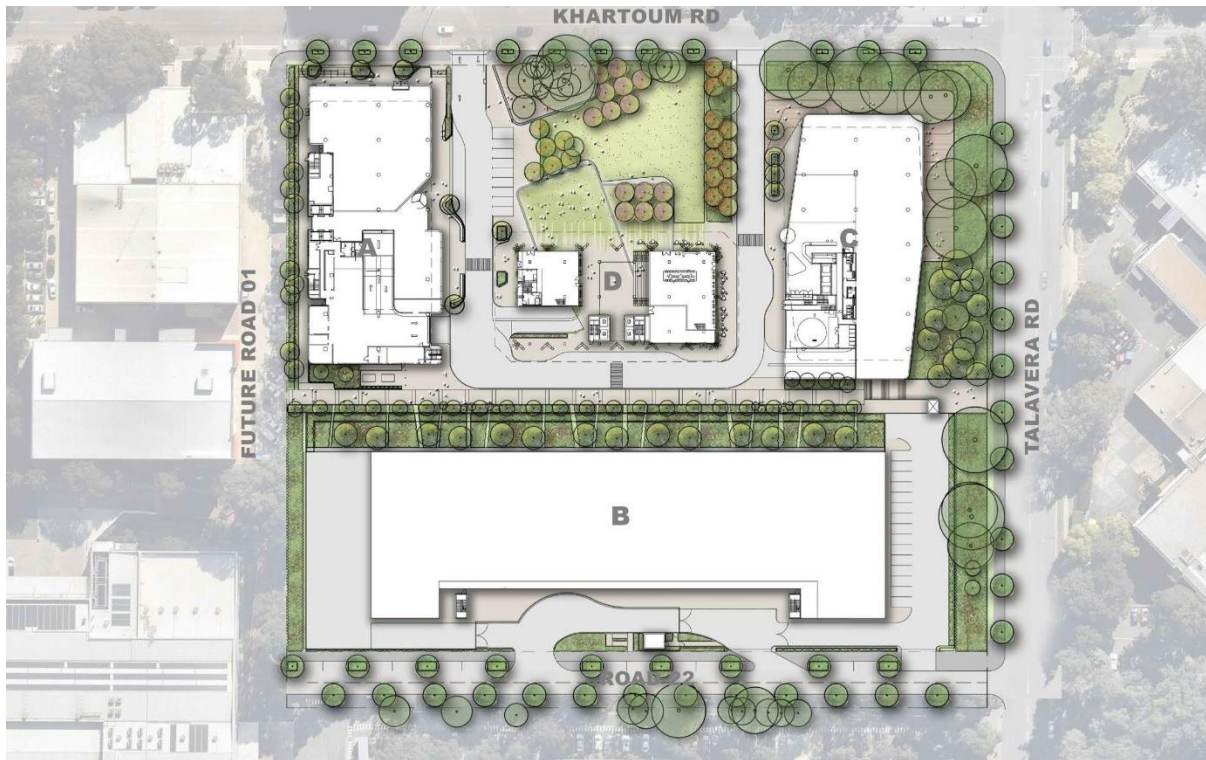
M\_Park Landscape Concept (Source: Site Image Landscape Architects, September 2020).
